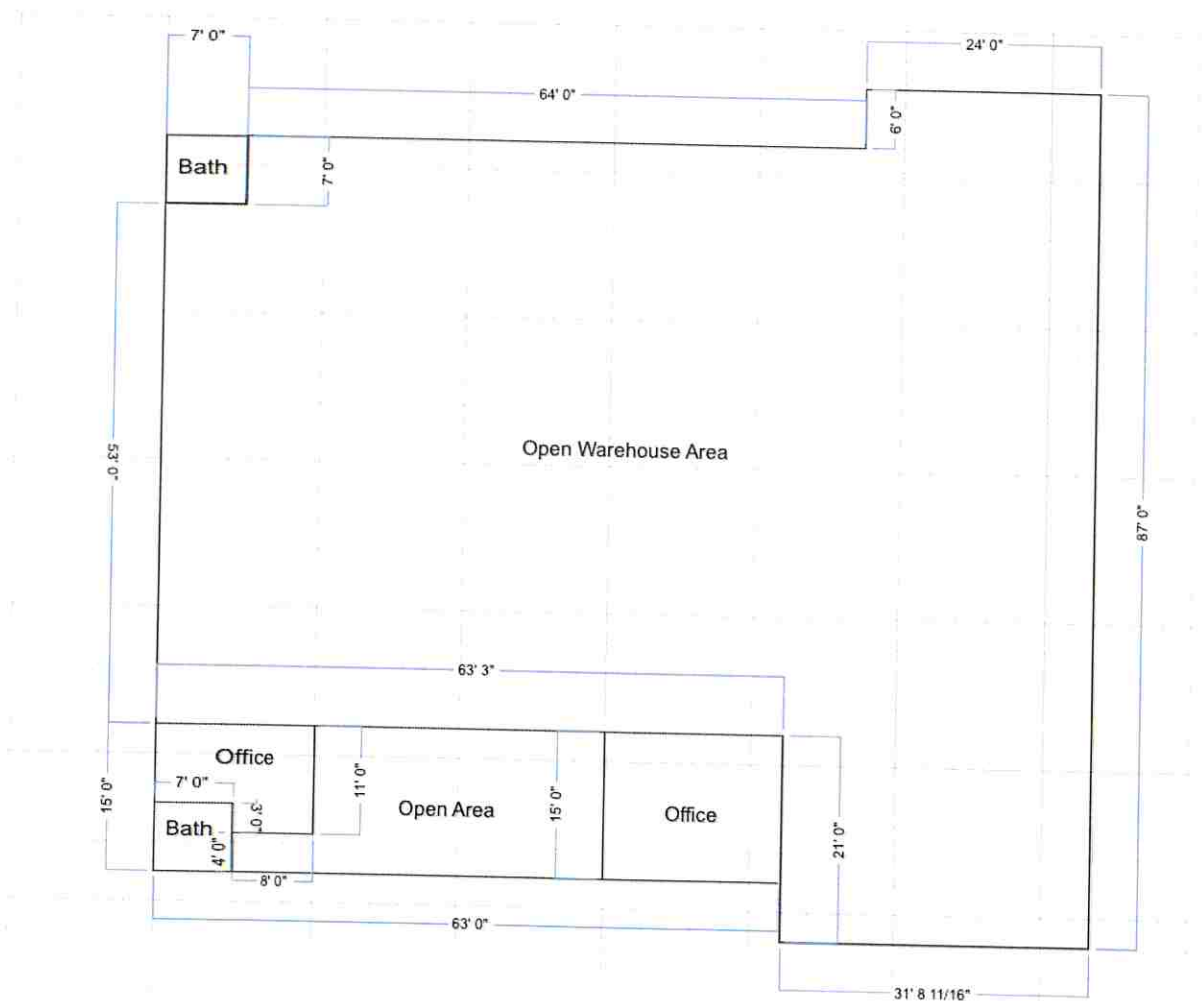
This is the proposed the main floor level plan. The only addition would be a turf area with walls on the perimeter. Scale – 1 inch = 15 Ft. Diagram has ft shown.
